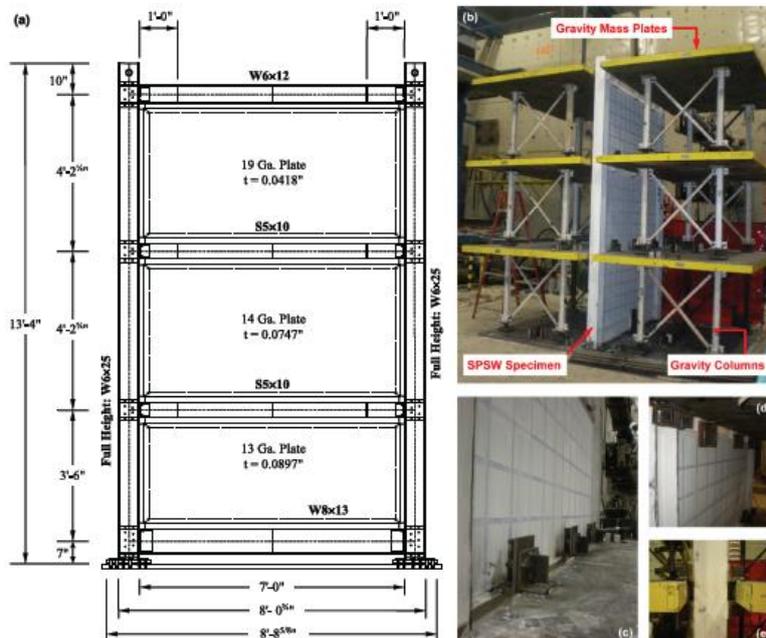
Three-story SPSW specimen: (a) elevation view; (b) experimental setup with gravity column system; (c) angles for load transfer mechanism; (d) and (e) angles for lateral supports at HBE bottom flange and both sides of VBEs.
